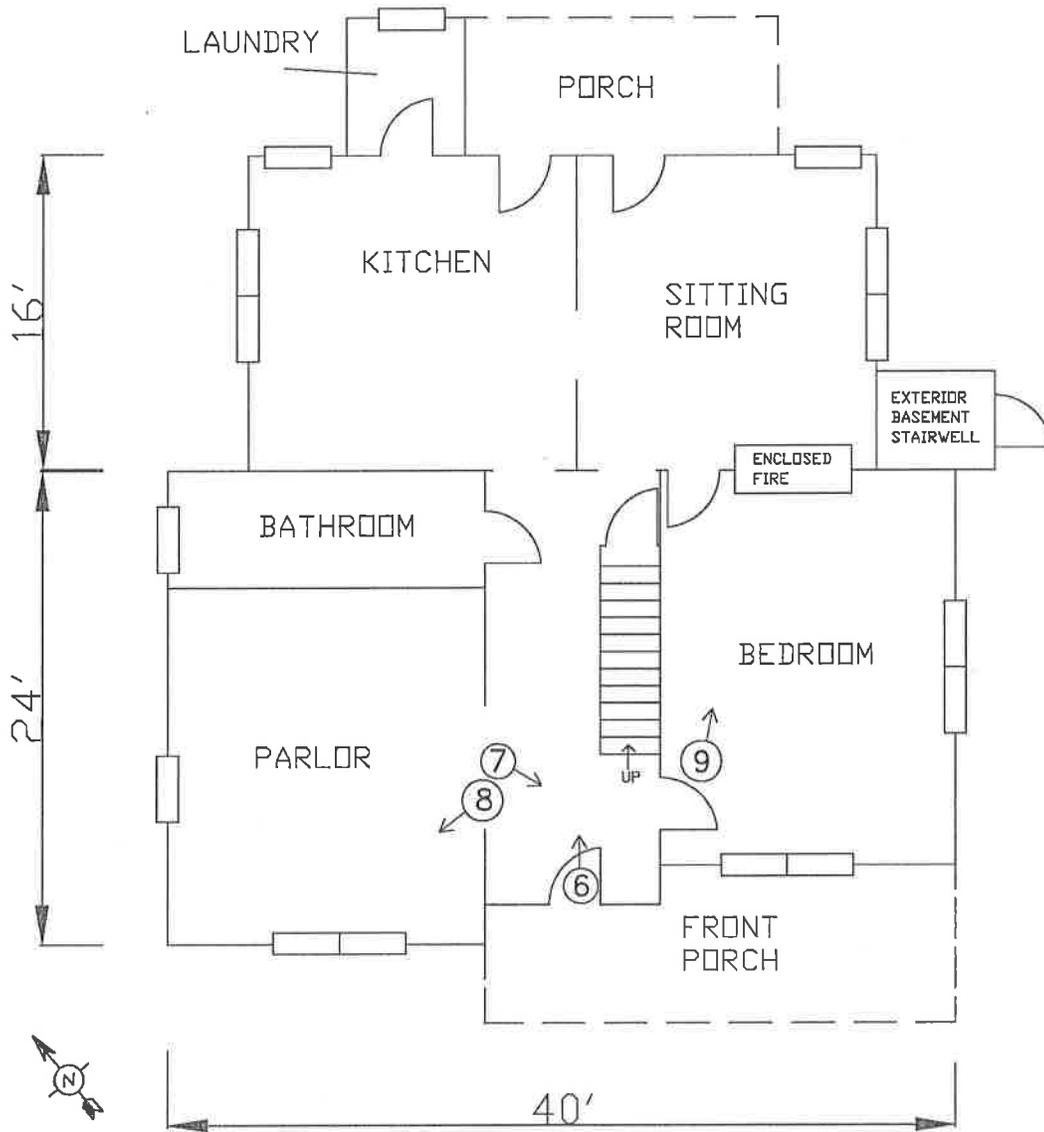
First Floor Plan and Photographic Locations (Not to Scale)
